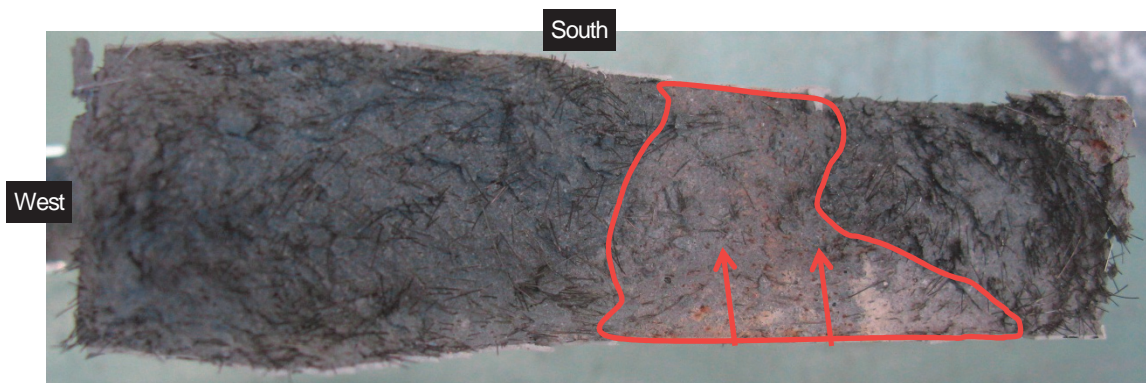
Fatigue fracture surface of S3-1 test specimen (upper half of the fractured specimen)
